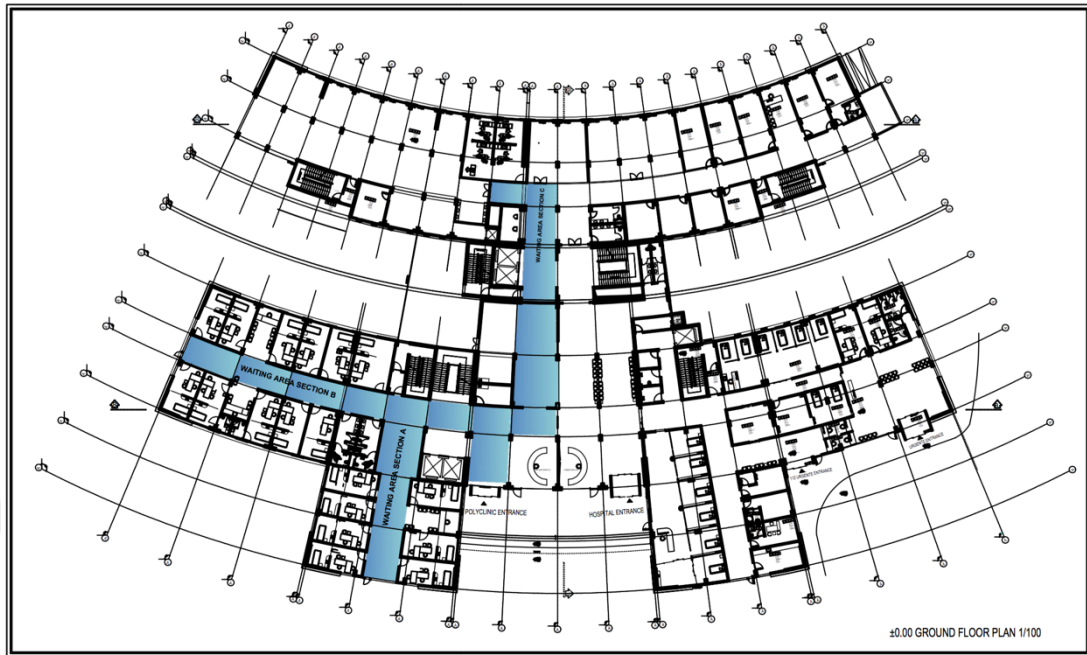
Çeşme State Hospital ground floor plan (Min. of Health).
